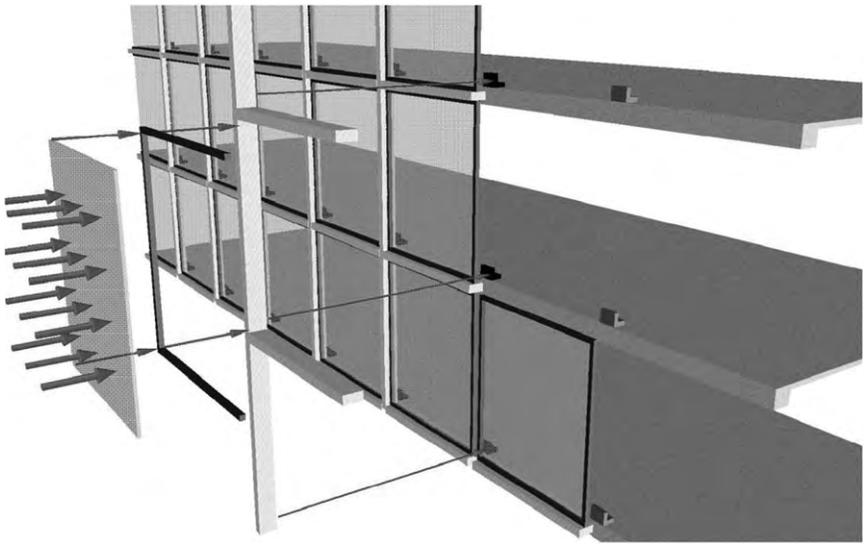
Basic curtain wall structure; wind load flows from the panel surface to perimeter supports, onto framing members (vertical mullions and horizontal beams), and finally onto the building's primary structure
